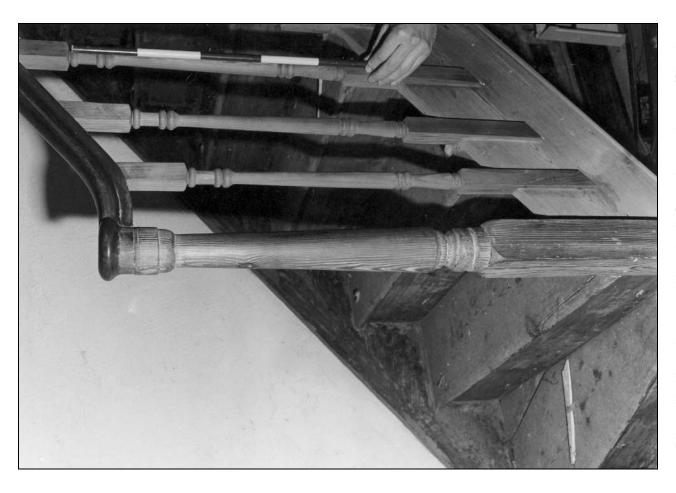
Newel post and hand rail, from the north-east (film 4, frame 1)
